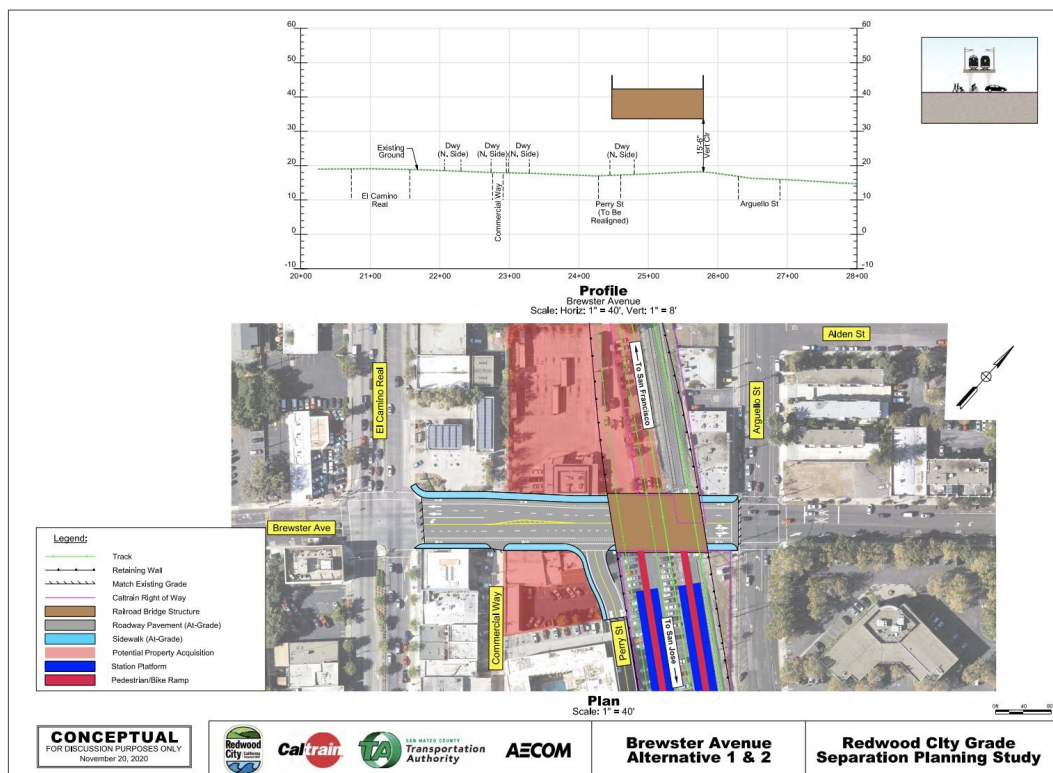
Changes to Brewster Avenue for Design Alternatives 1 and 2 (Redwood City, 2020)
